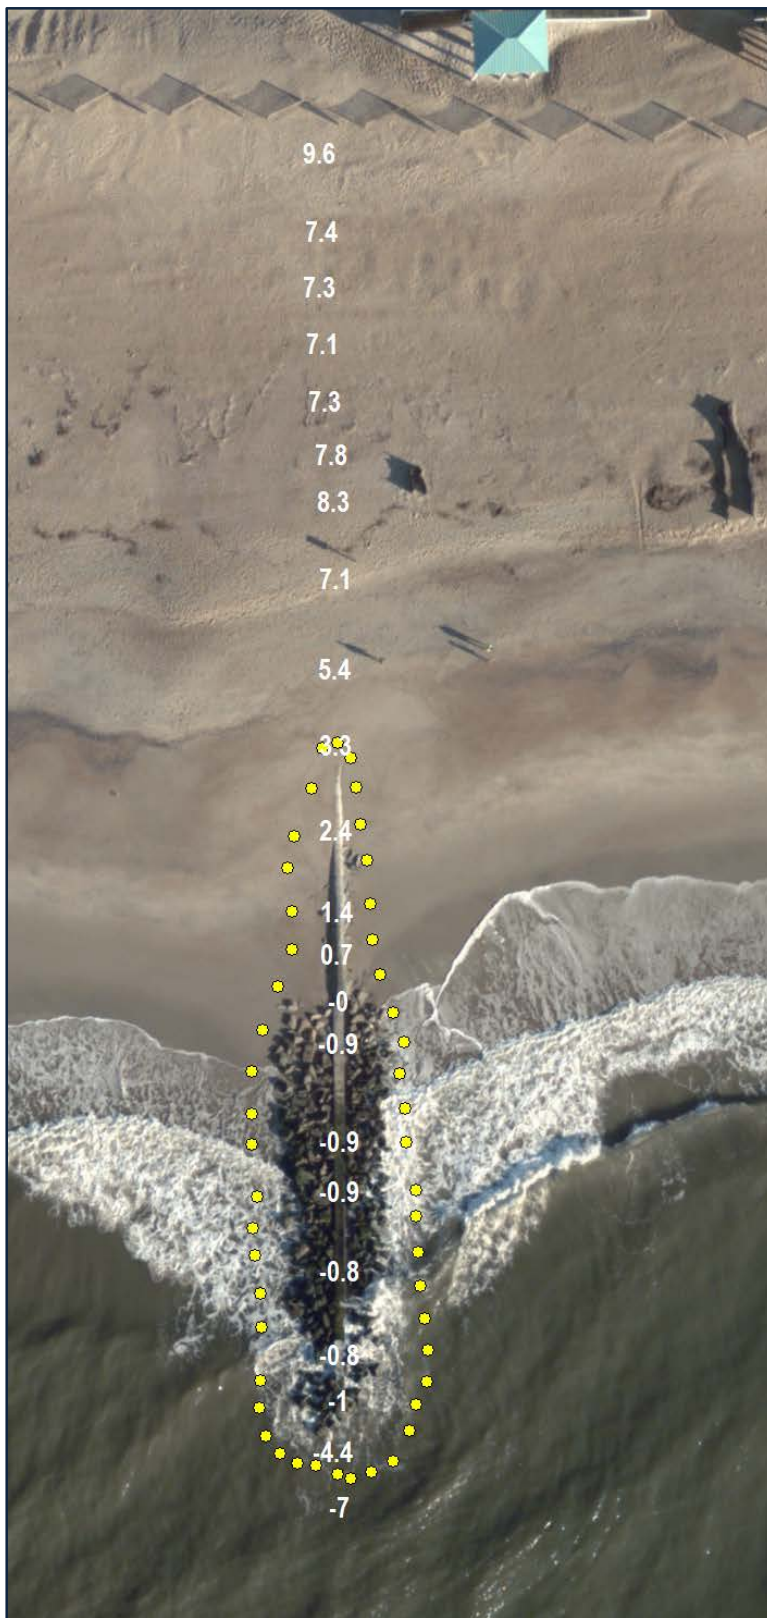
Plan view of a typical groin extension using sheet pile and concrete cap. Elevations are labeled in white and the footprint of the accessible armor stone is shown in yellow. This extension began near the “0 ft NAVD” contour.
